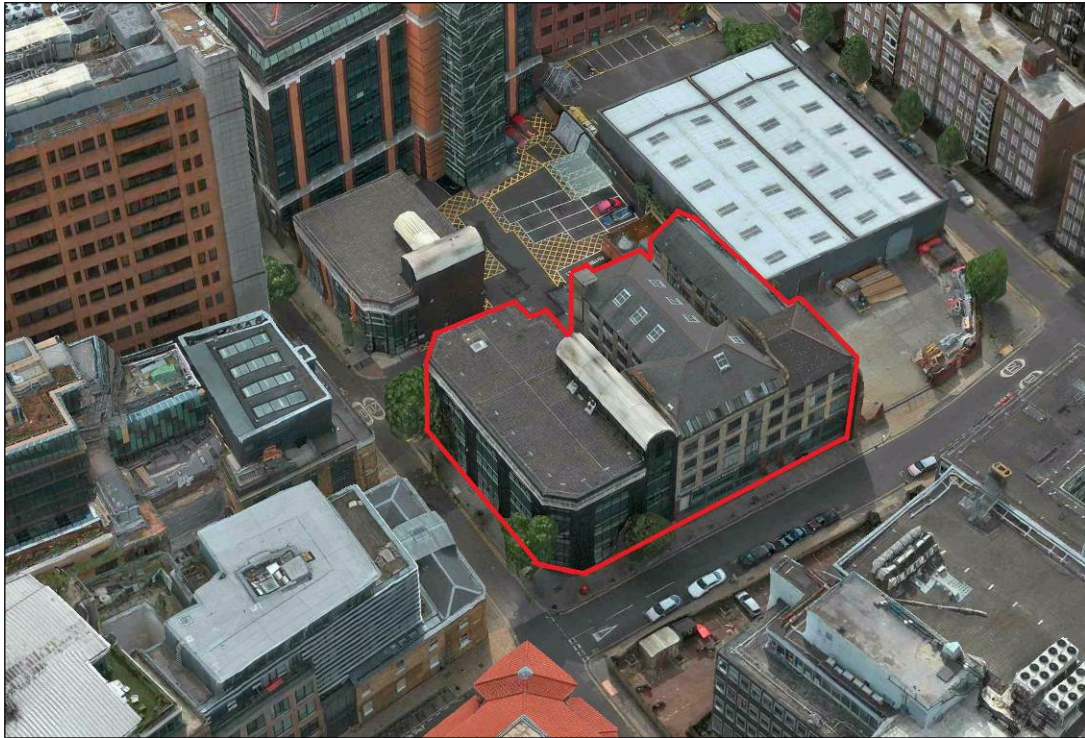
Aerial view of site (with the existing buildings outlined in red) and immediate surroundings.
